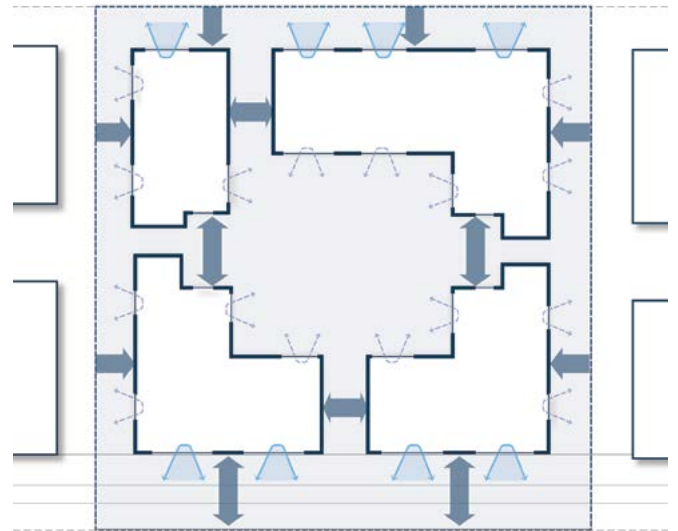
Appropriate setbacks to neighbouring sites and separations within a development area to ensure maximum outlook amenity for dwellings, streets interface and the open spaces between the buildings.
